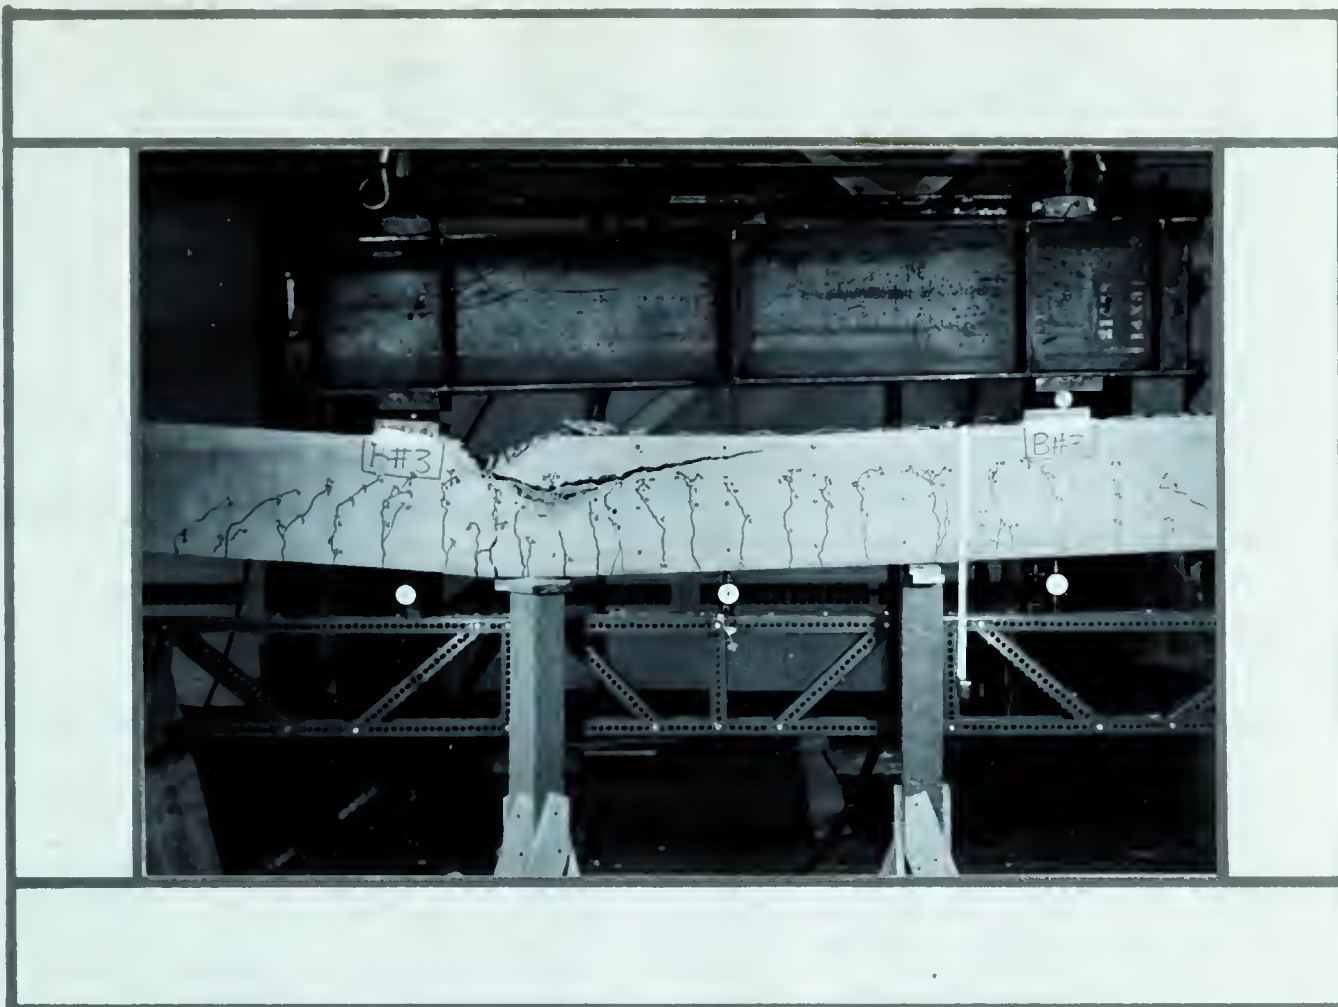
TYPICAL FAILURE OF A TWO-POINT LOADED BEAM
